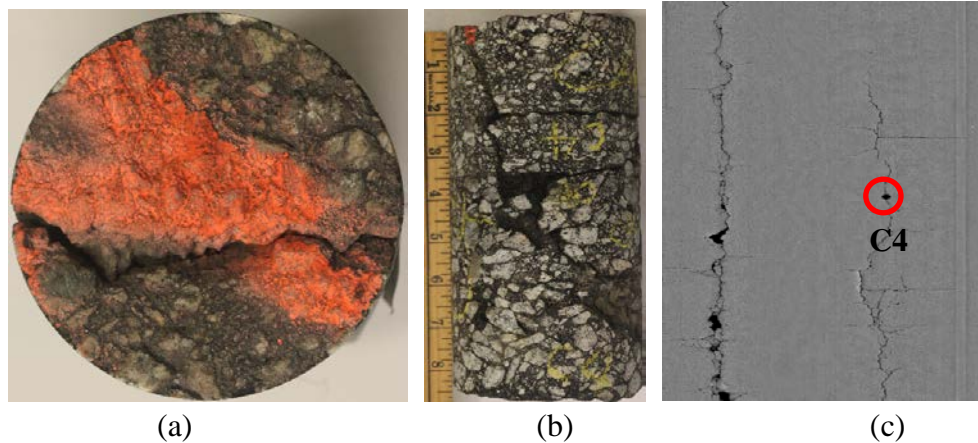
Pavement Core C4 - (a) Top, (b) side, and (c) surroundings
